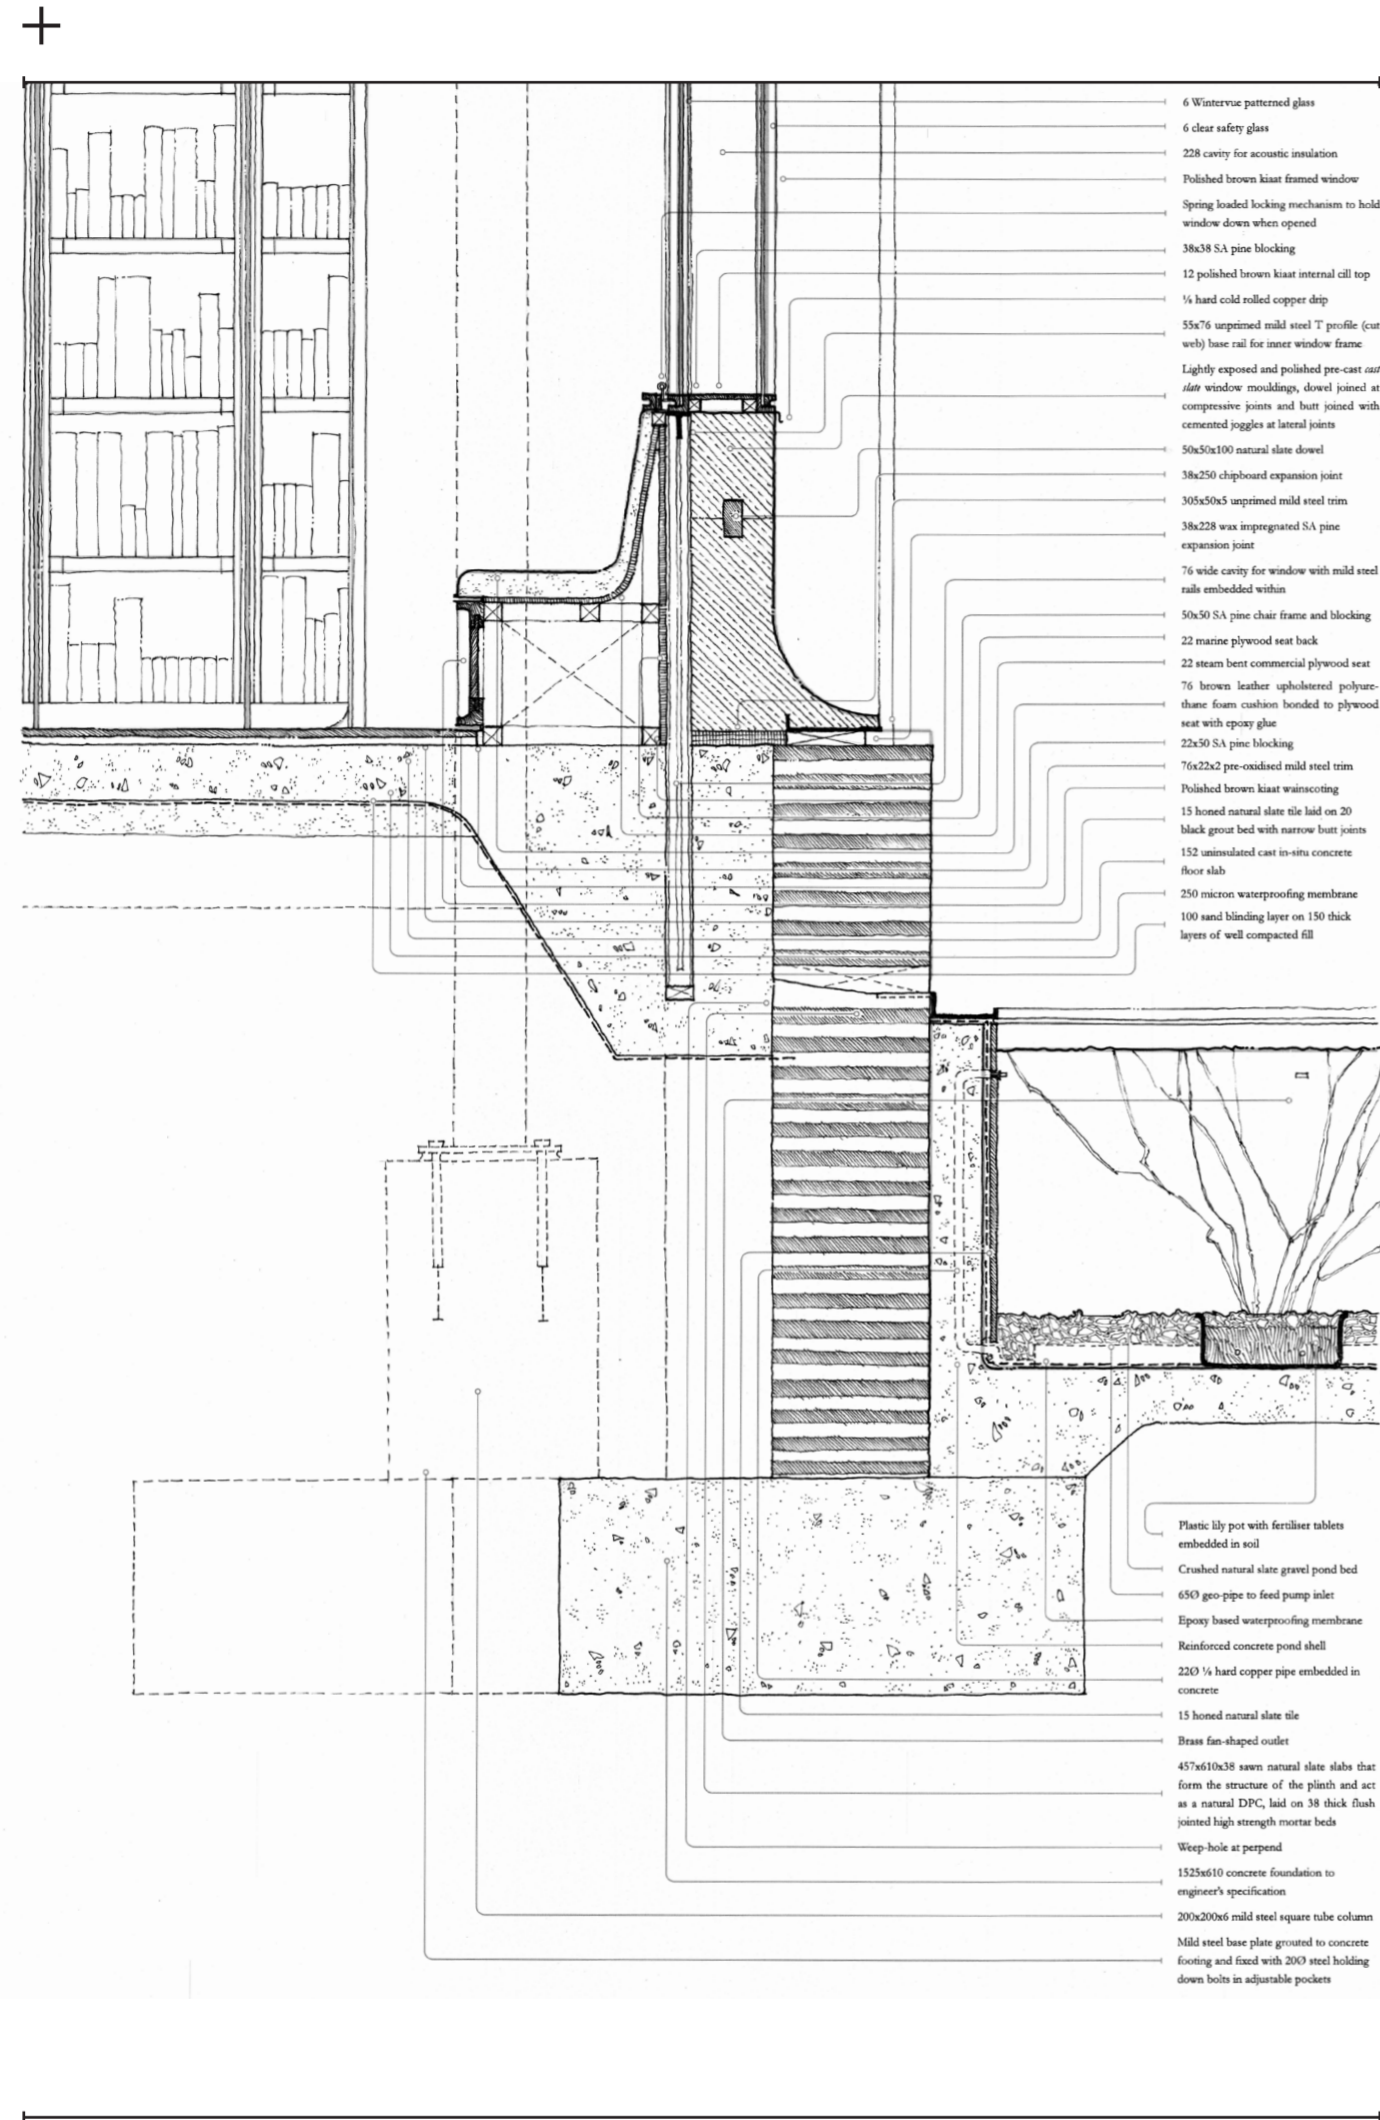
Floor to wall detail drawn at scale 1 : 10
